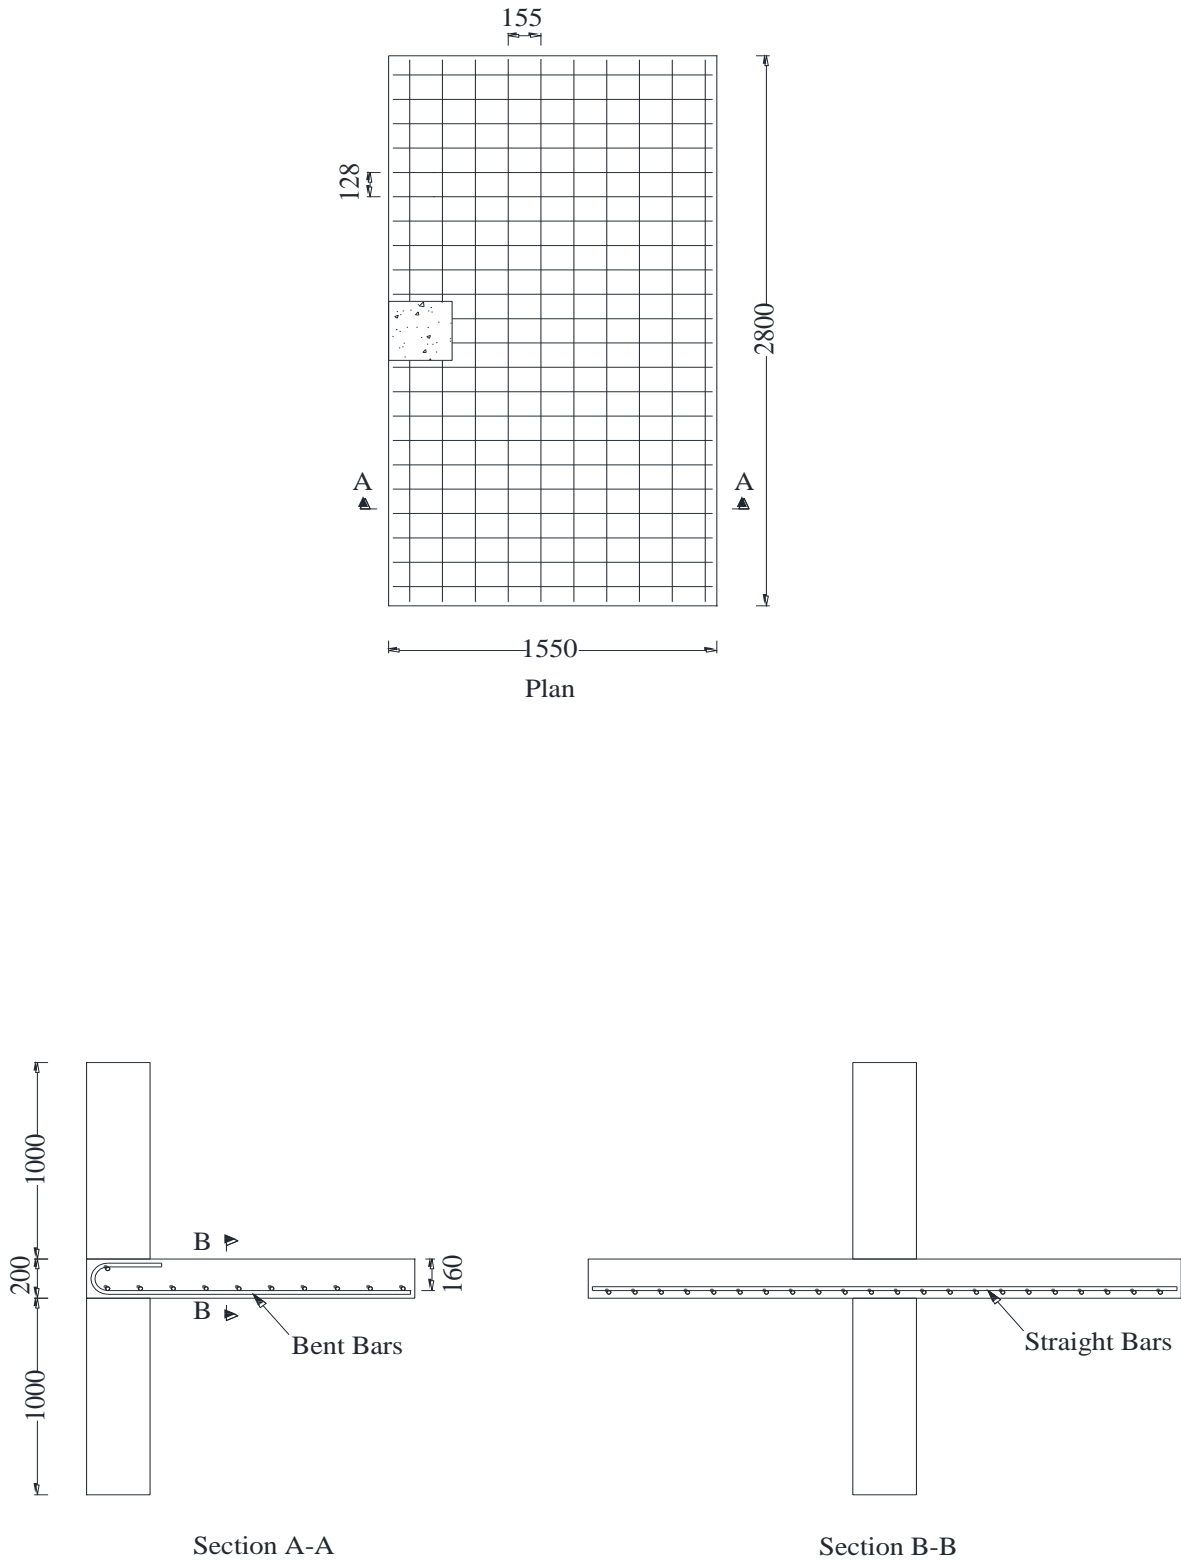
Dimensions and flexural reinforcement layout of connection H-1.35-XX (all dimensions are in mm)
